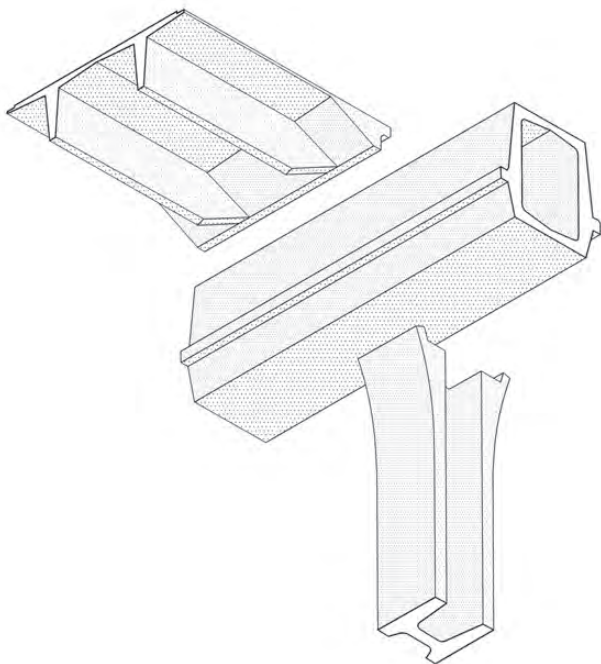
Bay'S Technics Assembly of Kodak Factory in Marcianise. Arch. Gianluigi Ghò, 1972. Outline proposal drawing coming from Archivio Privato Gianluigi Ghò, Milano, ©Archivio gigi ghò (authorized reproduction).
